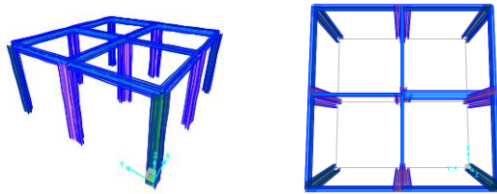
Floor plan of RISHA type 36 (Mudawarisman et al., 2020).
